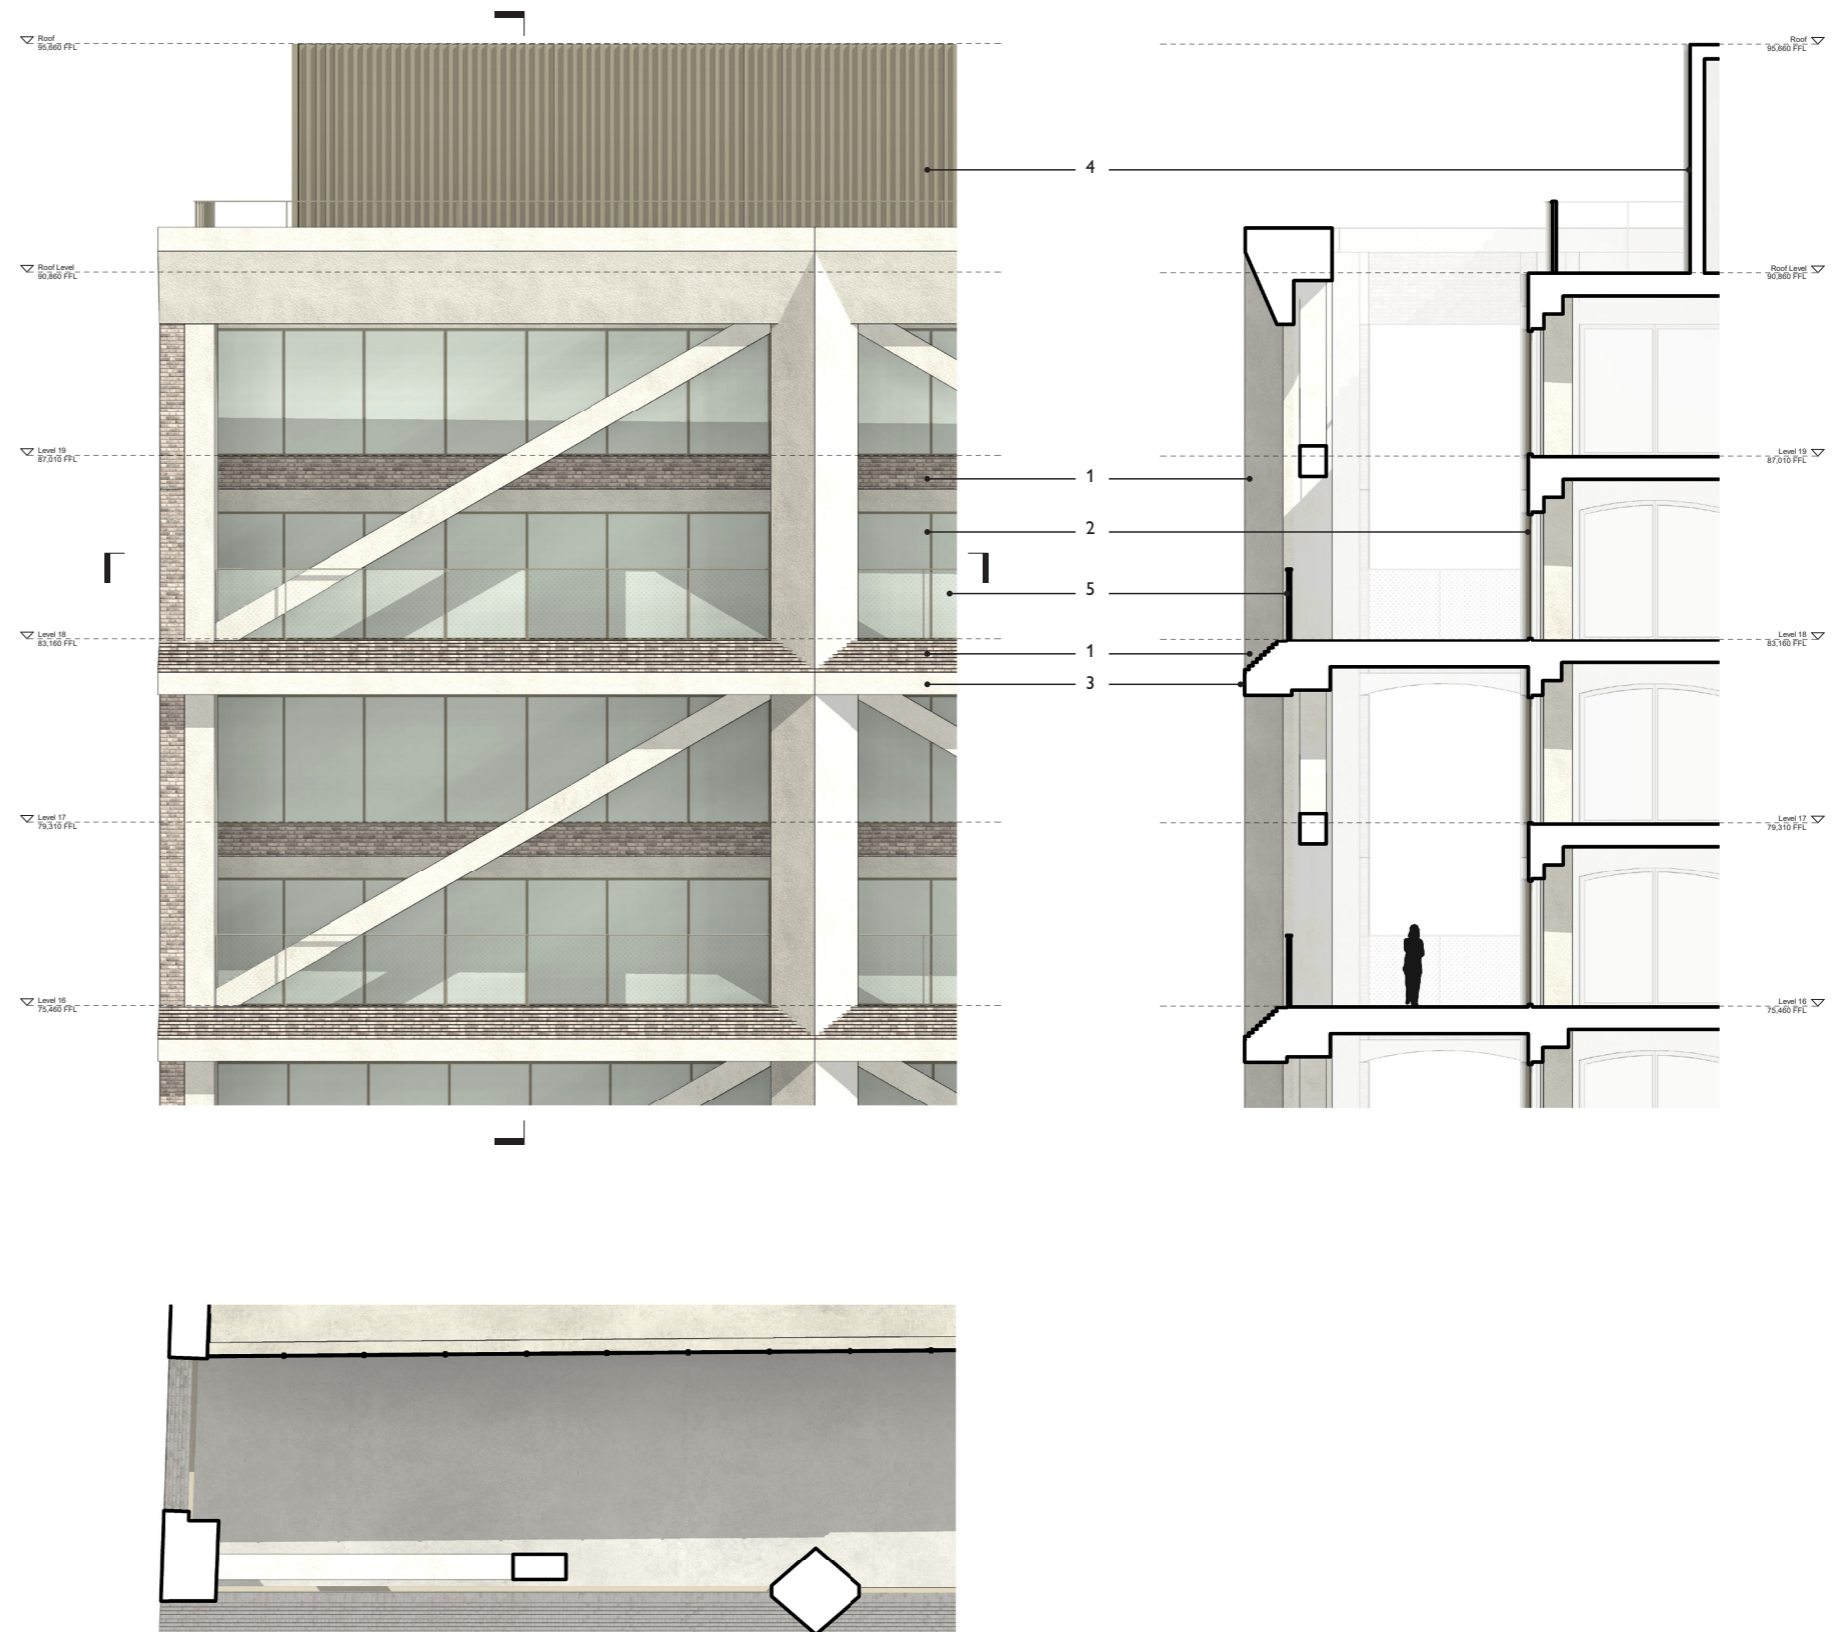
West Façade - typical plan, section & elevation - top
